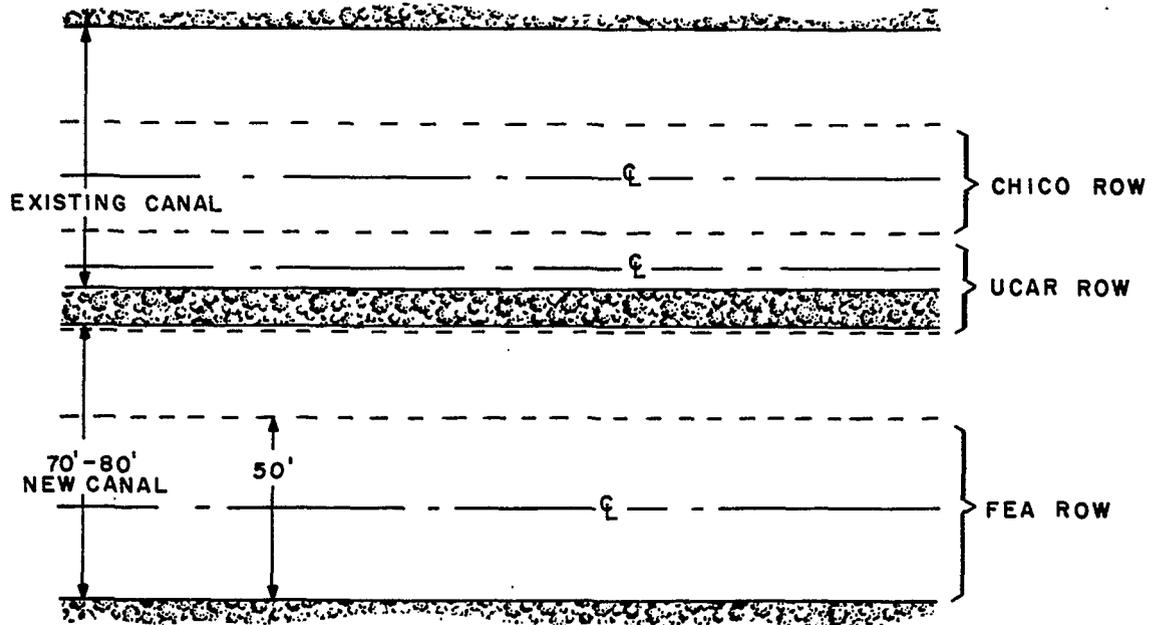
South Bank Pipeline Construction Alternative.
